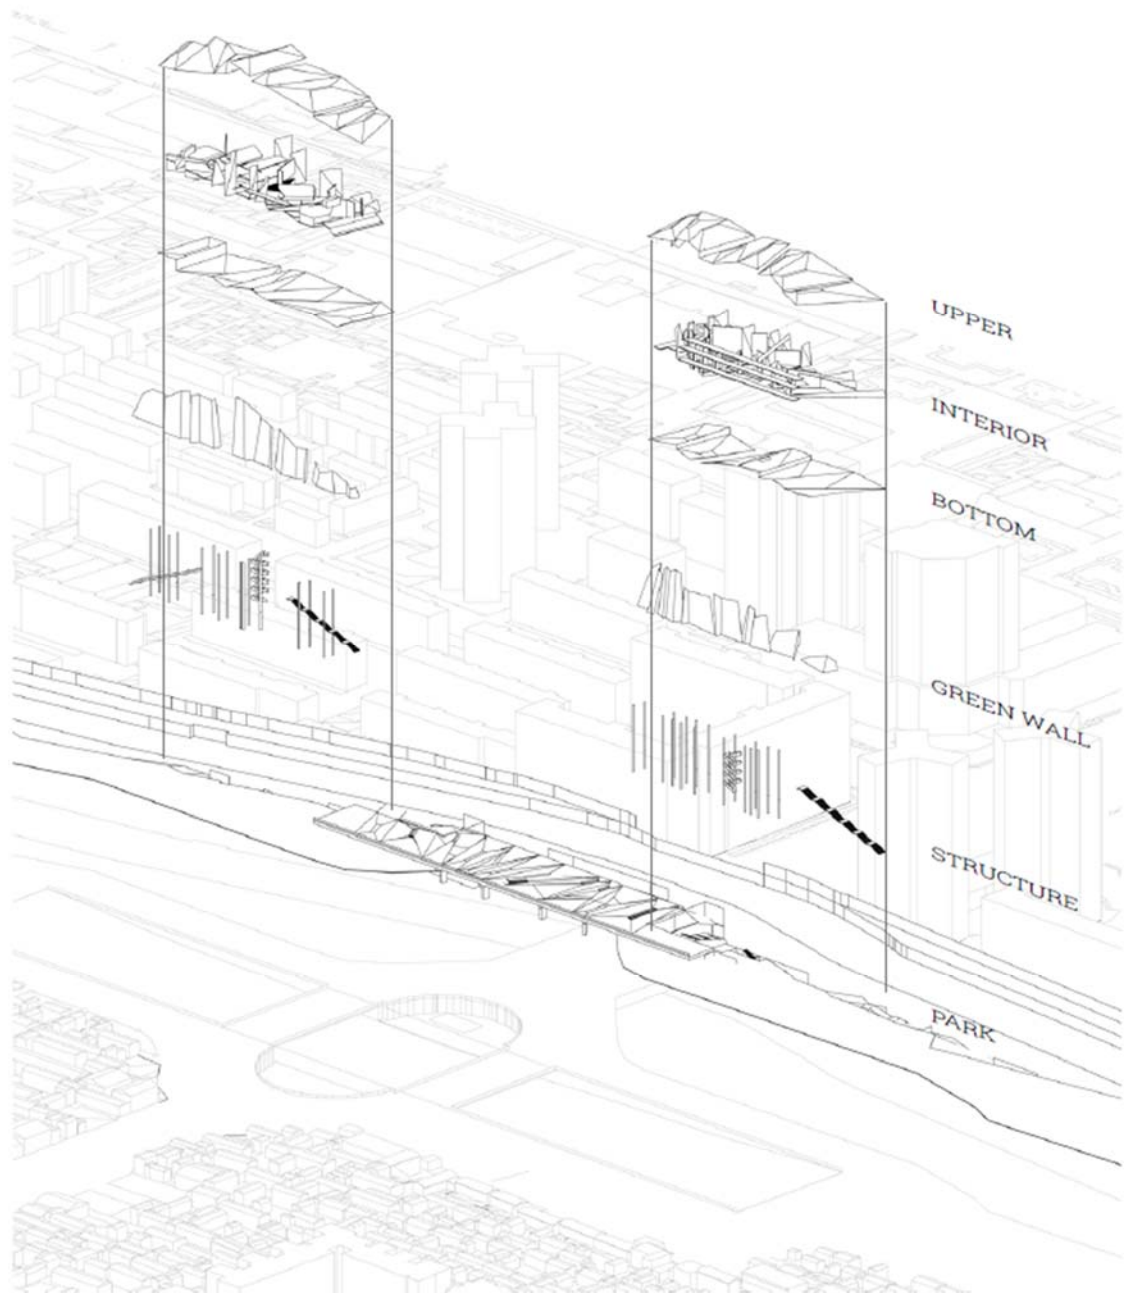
Exploded axonometric view (Image source: author's own drawing)
